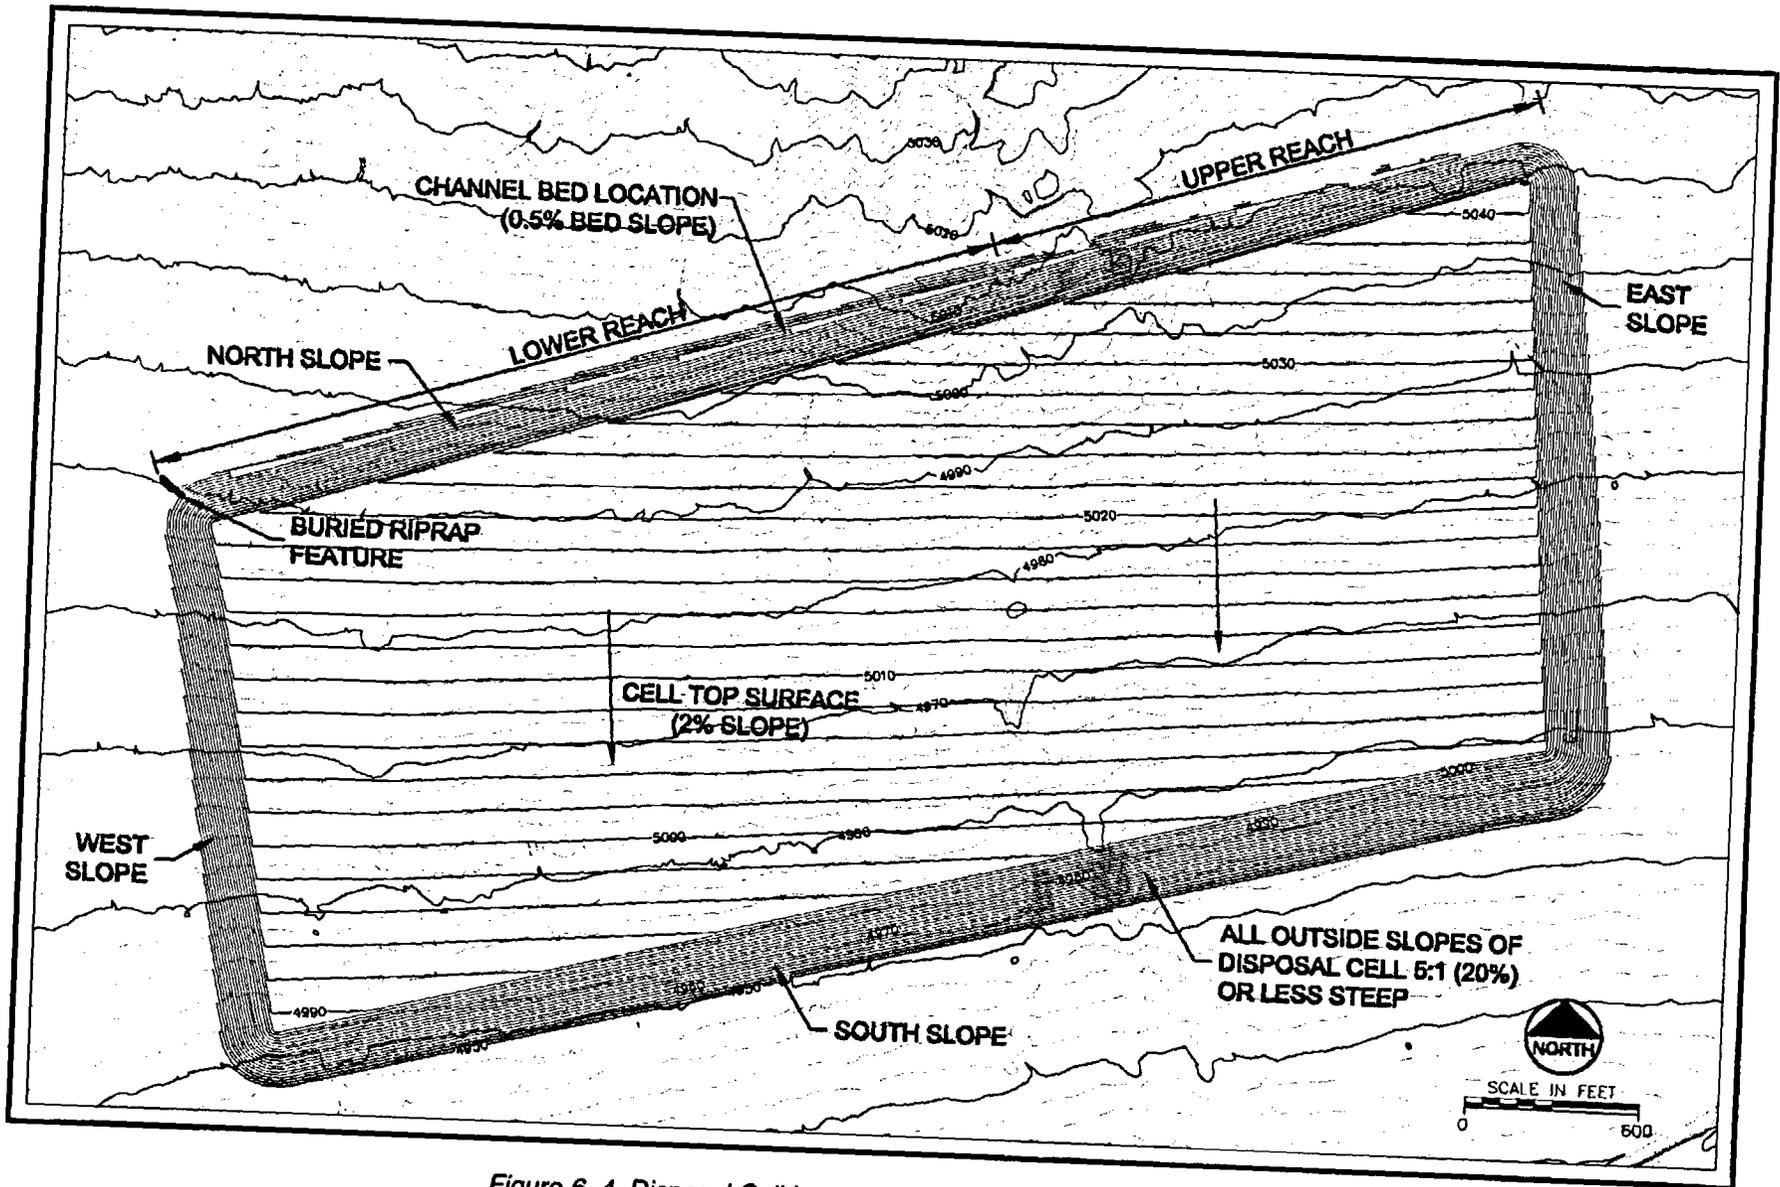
Disposal Cell Layout with Erosion Protection Features
